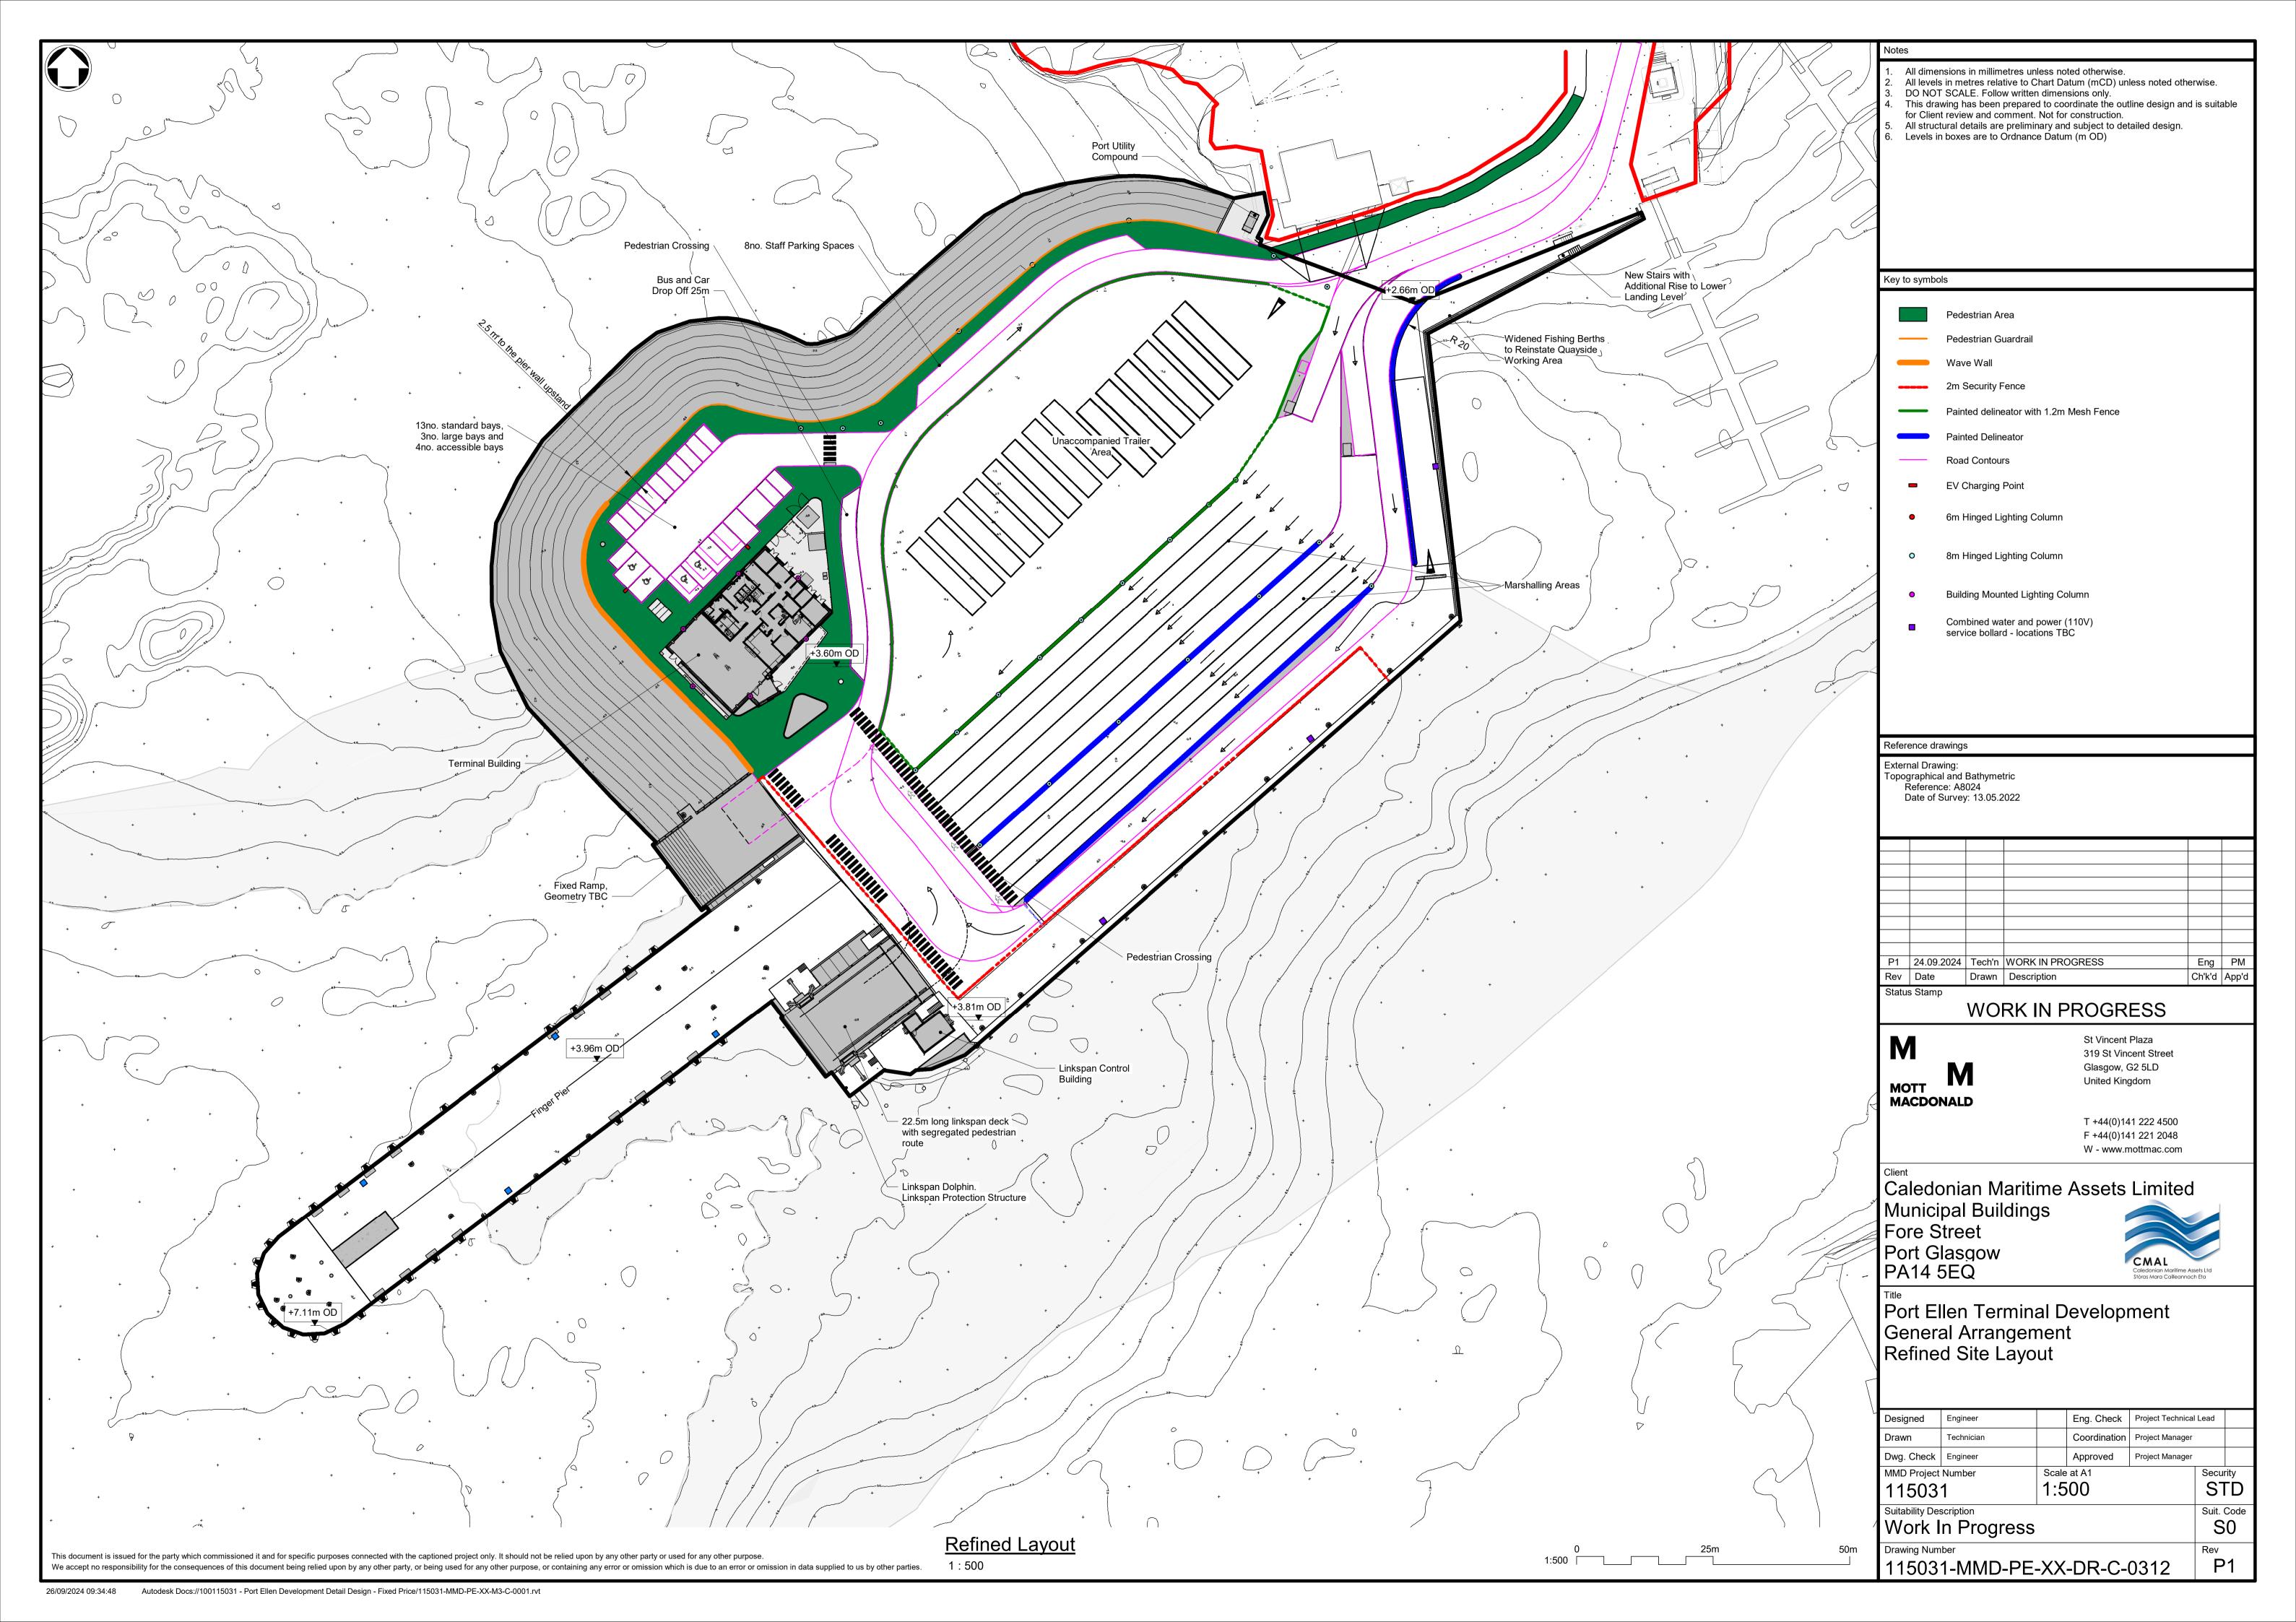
2: Proposed Port Ellen Terminal Development Layout
